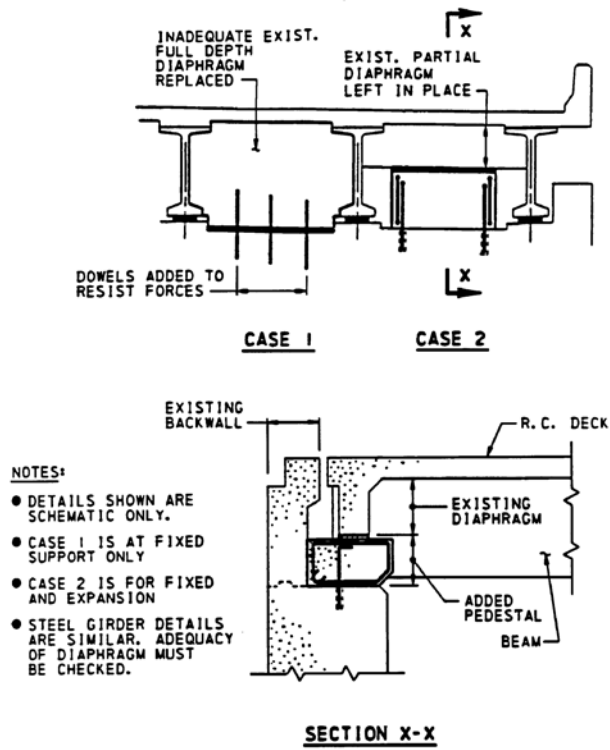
Retrofit Using Shear Blocks or Additional Dowel Bars
